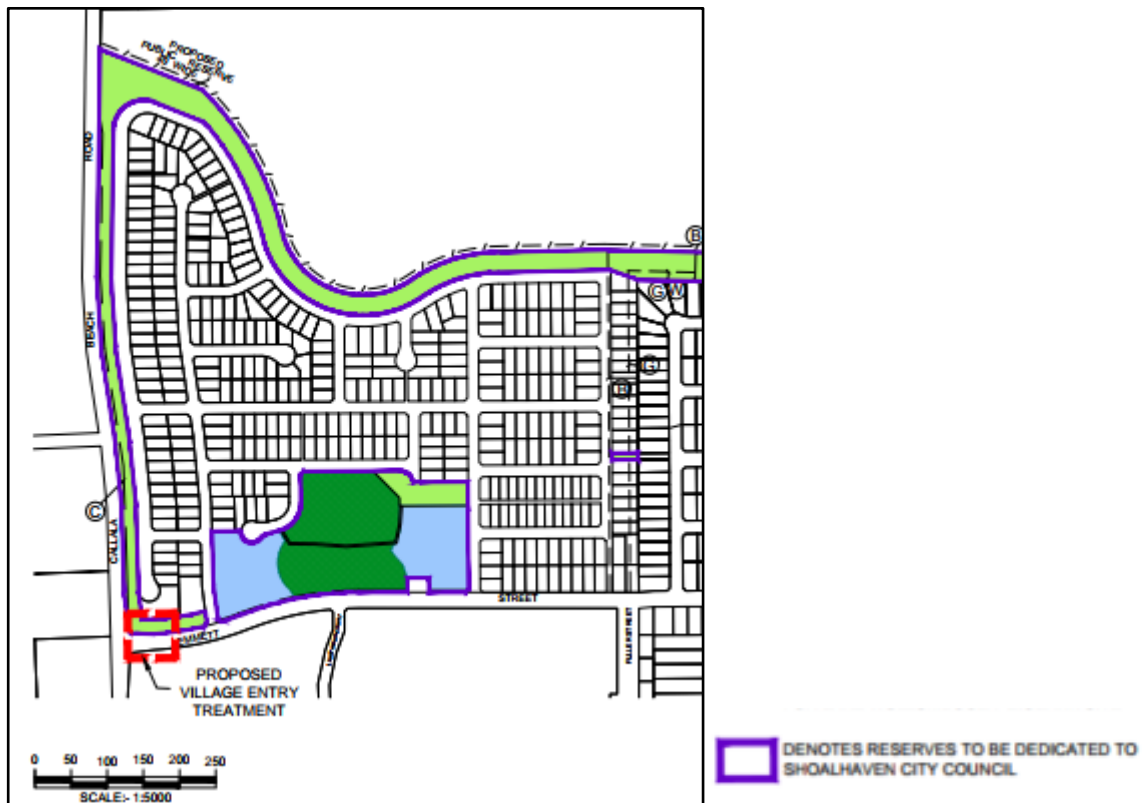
Proposed open space reserve (zoomed in extract - Shown in more detail in Appendix A and separate plans are provided as part of the accompanying plans to the proposal)
